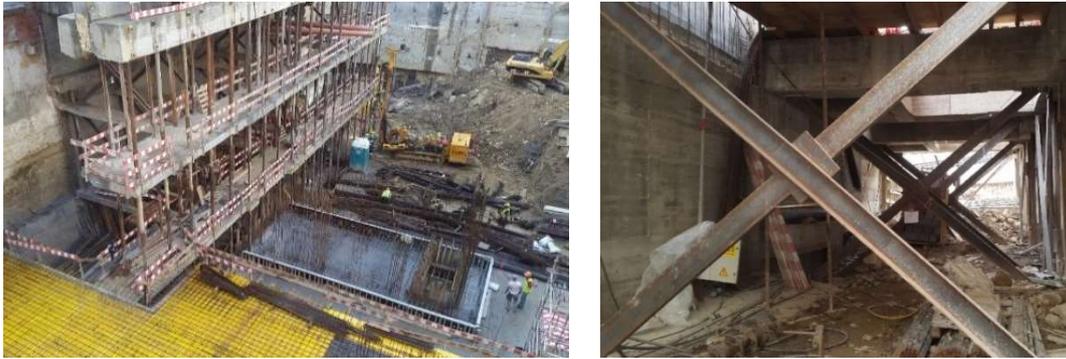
Concrete slab bands (left) and diagonal UNP metallic profiles (right)
